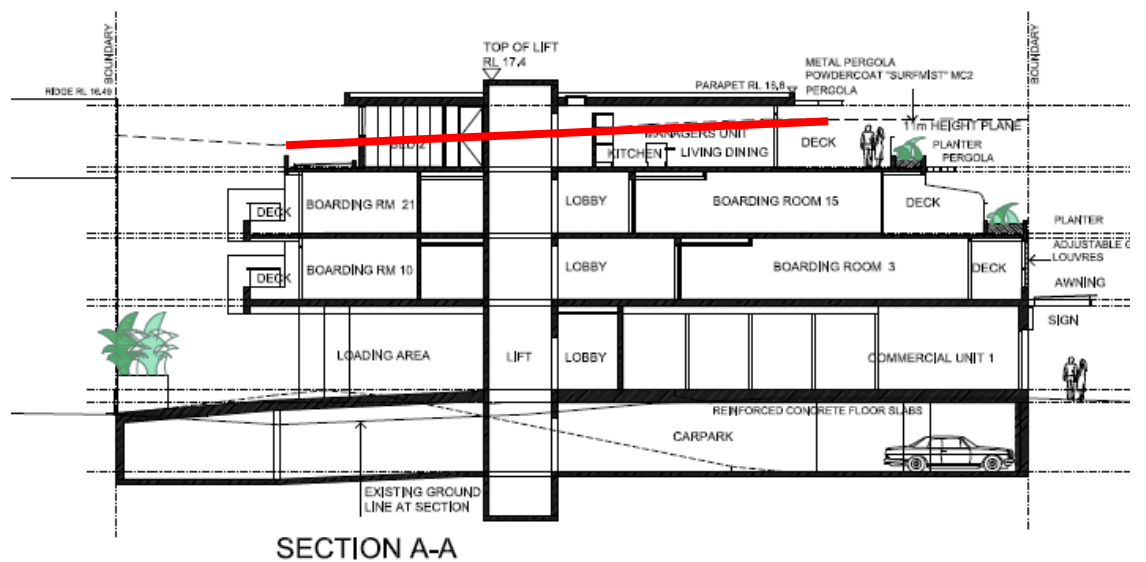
Plan (section A-A) extract showing extent of 11 metre building height breach
